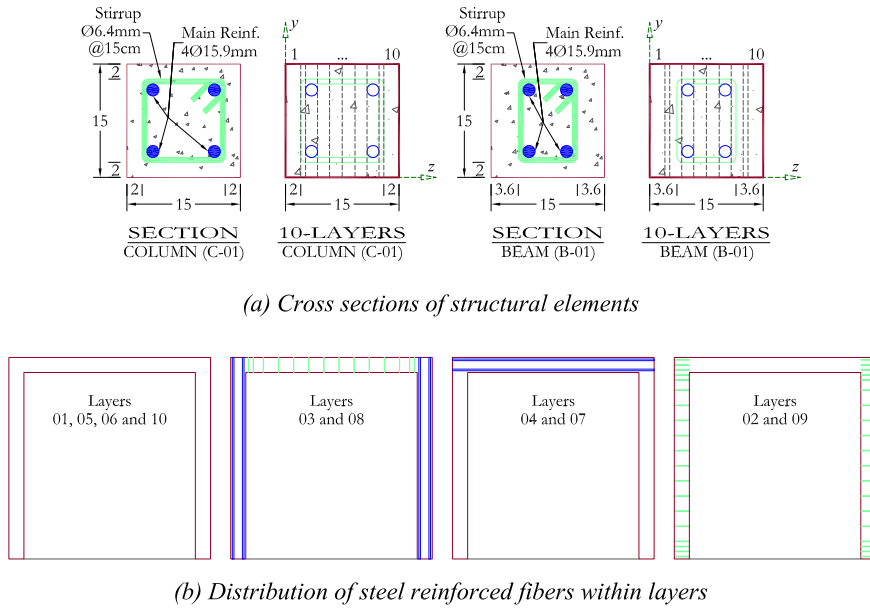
Distribution of reinforced fibers, and cross section of structural elements for a reinforced concrete frame with masonry in-fills.
